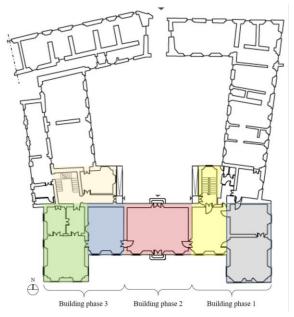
Plan of Trotti Palace complex with a layout of the main constructive phases of the principal 17th century building.
